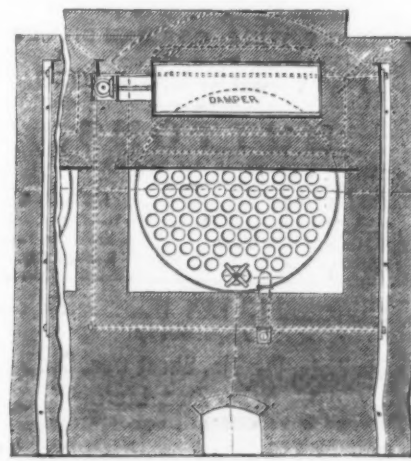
Cross Section through the Back Connections, showing Damper, Rear End of Boiler and Air Spaces in the Brickwork.
